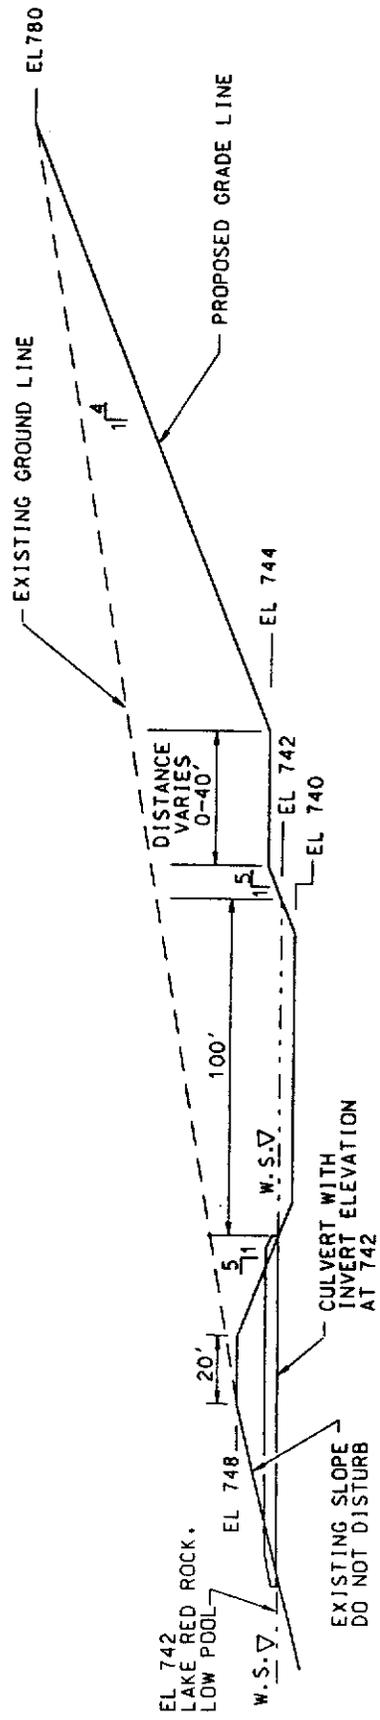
WETLAND MITIGATION SITE, TYPICAL SECTION
